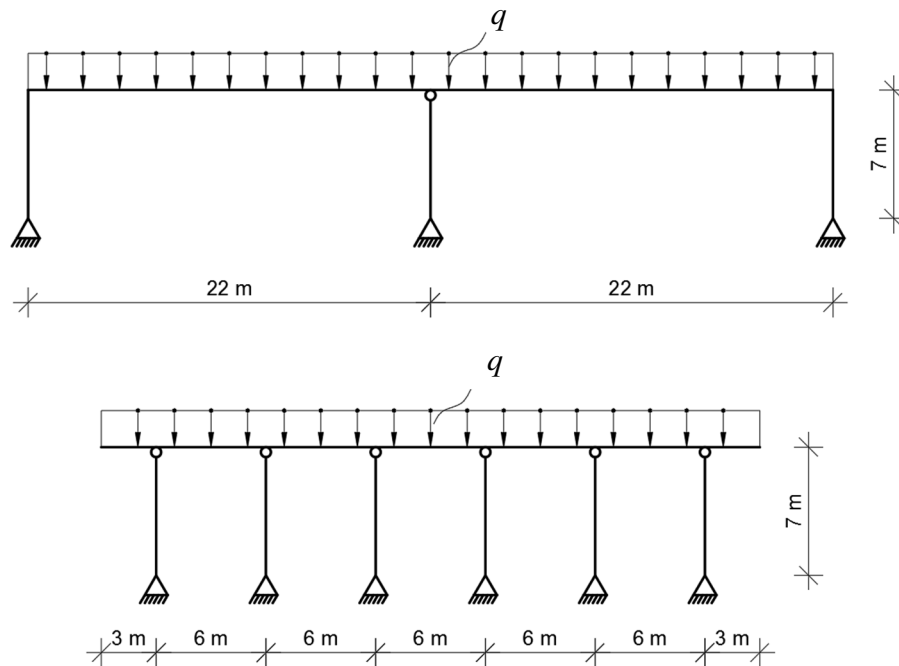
Static model of the bridge. The section at the top shows the cross section in the longitudinal direction. The section at the bottom shows the cross section in the transversal direction at the columns.
